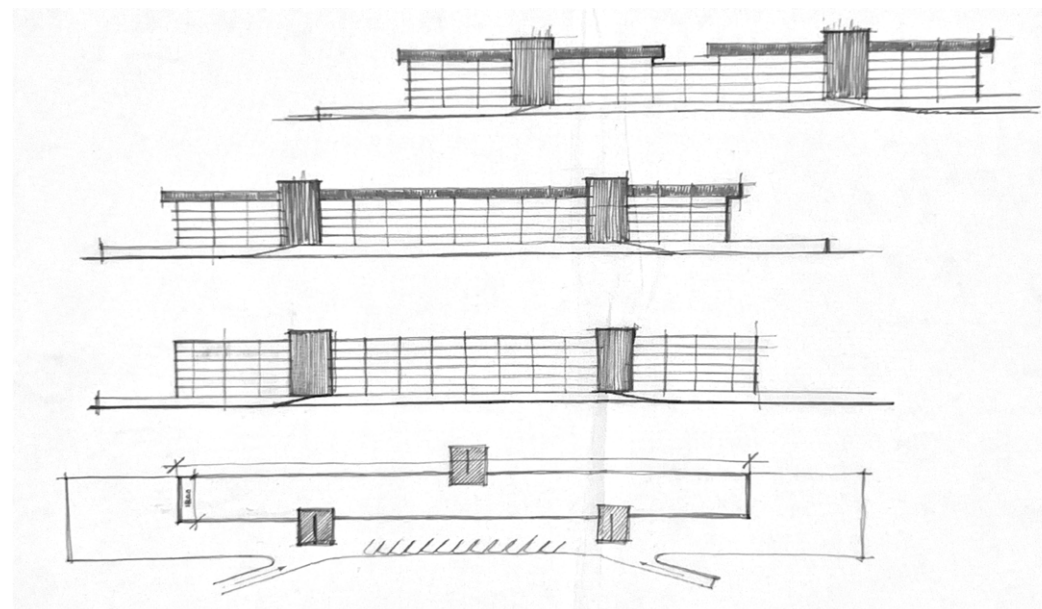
Alfa Romeo Office Building, Arese, 1968-74. Competition plans, floor plan sketches, and facade study. Gardella Historical Archive, CSAC.
